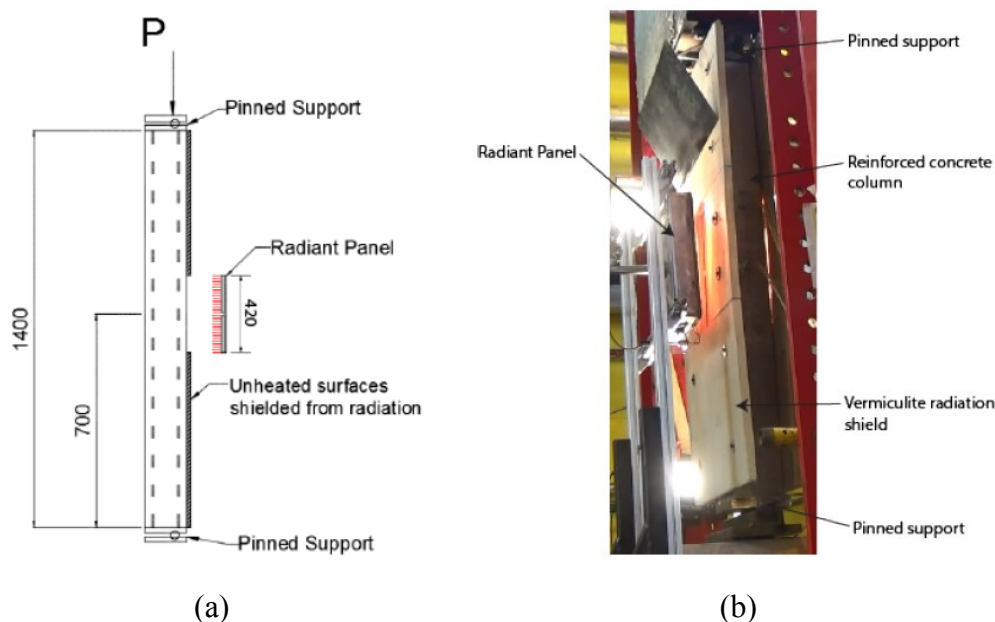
(a) Geometry of a typical column specimen; (b) photo of test set-up
